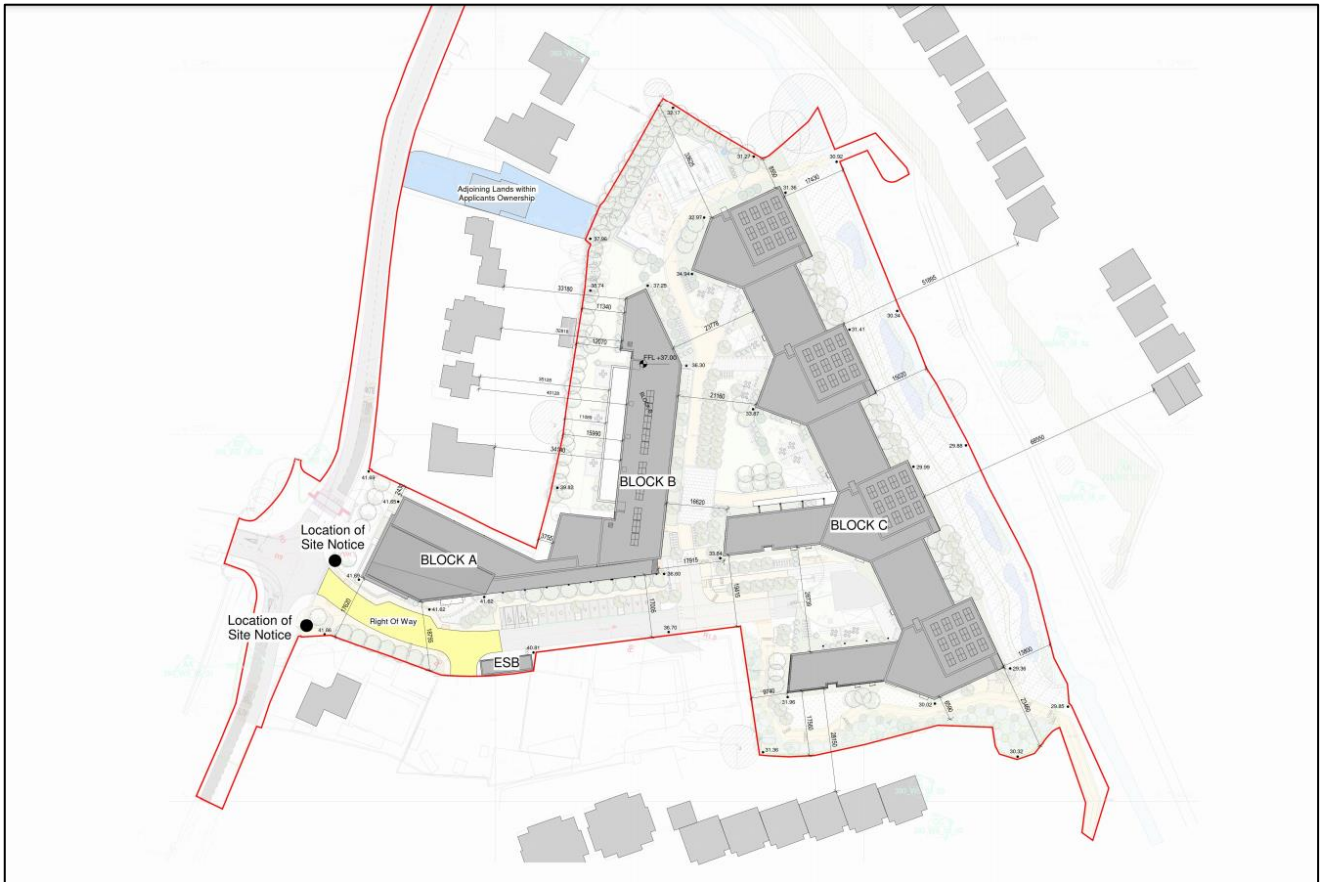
Site layout plan for Former Doyle's Nursery (Source: DLRC)
